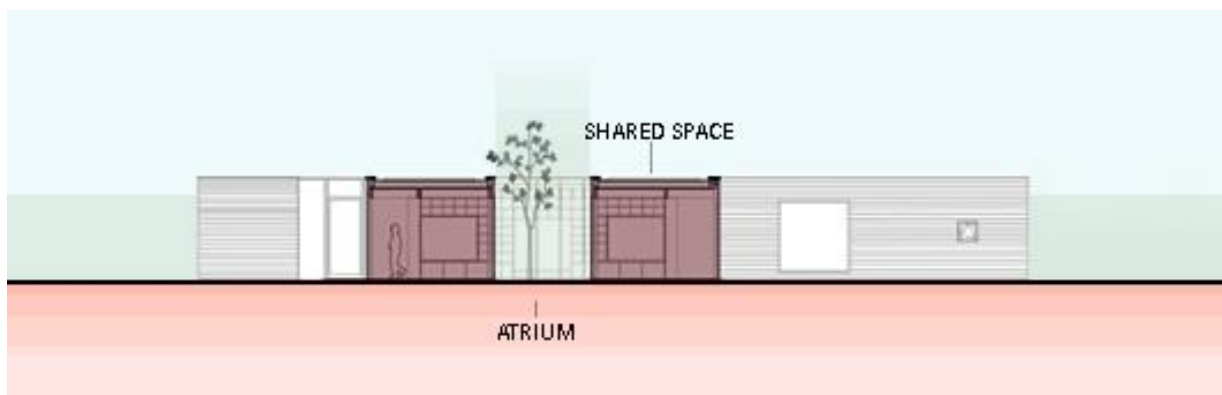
Cross Section Highlighting Space for Collaboration. Source: Author, 2021.
